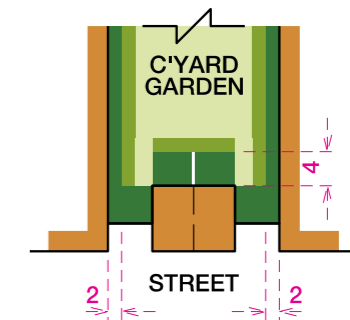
Plan diagram: First floor frontages behind Townhouses.
